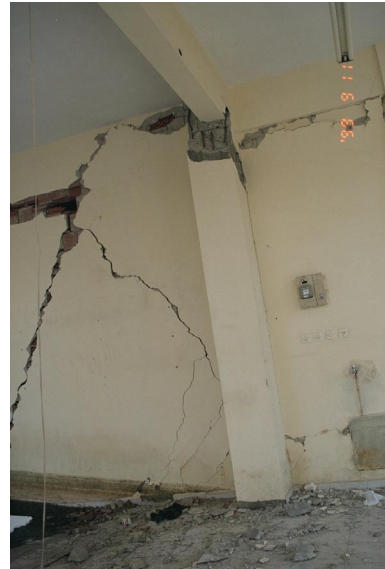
Damaged column of 1st floor of Building B in Adapazari, Sep. 1999.
